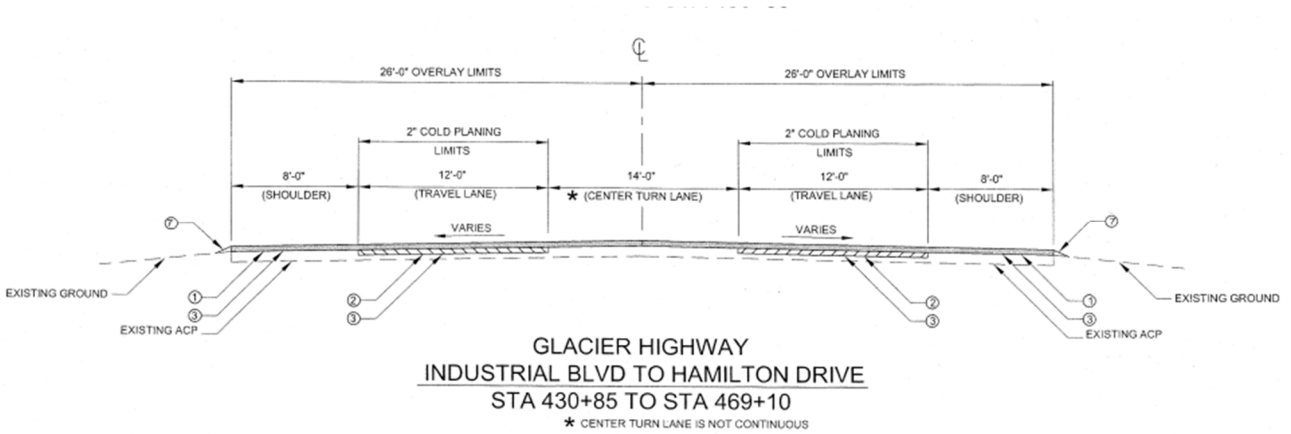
Typical Section – Glacier Highway from Industrial Boulevard to Hamilton Street
